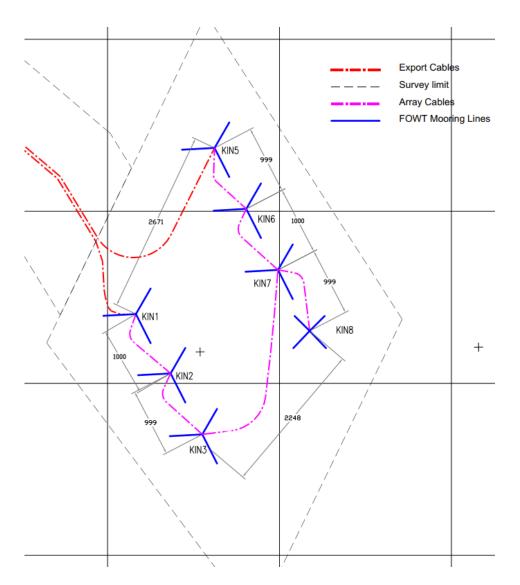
2MW and six 8.4MW turbine final layout plan showing spacing between the turbines
